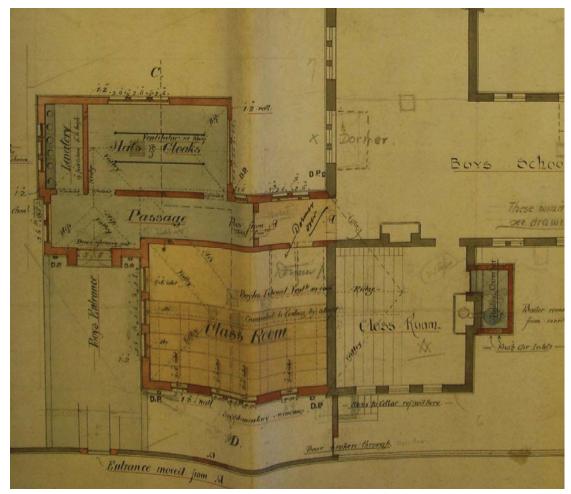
Detail of the proposed additions at the south-west end of the building, 1891 (CRO(B) Z1041 1875-1904)
